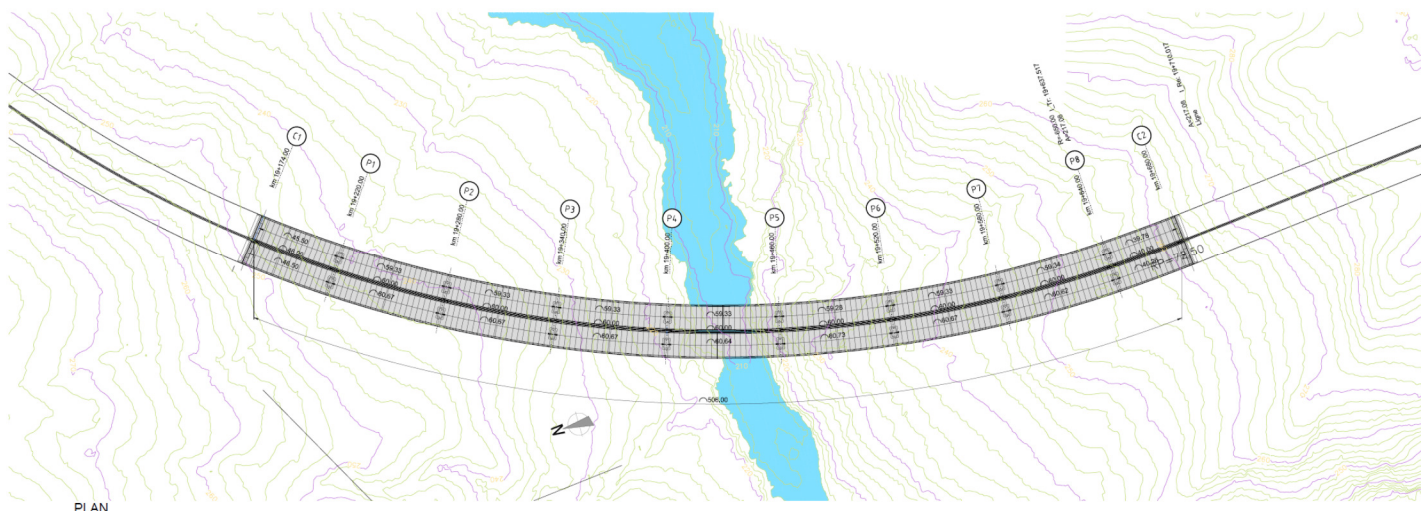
Plan view of Viaduct at chainage 19.200 / Vista planimetrica del viadotto alla progressiva 19.200.
